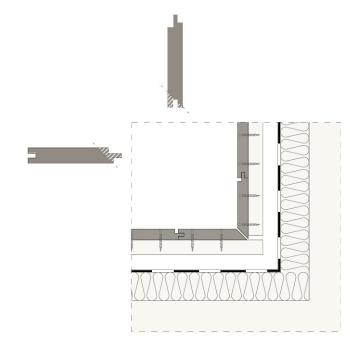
Internal corner finishing by cutting the board edges at a 45° angle
